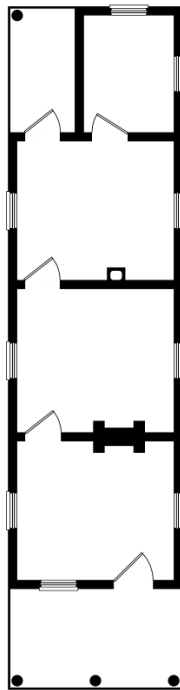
MN 46, Coppage House, early nineteenth century, side passage plan, Federal/Greek Revival style, Pleasant Valley vicinity.
